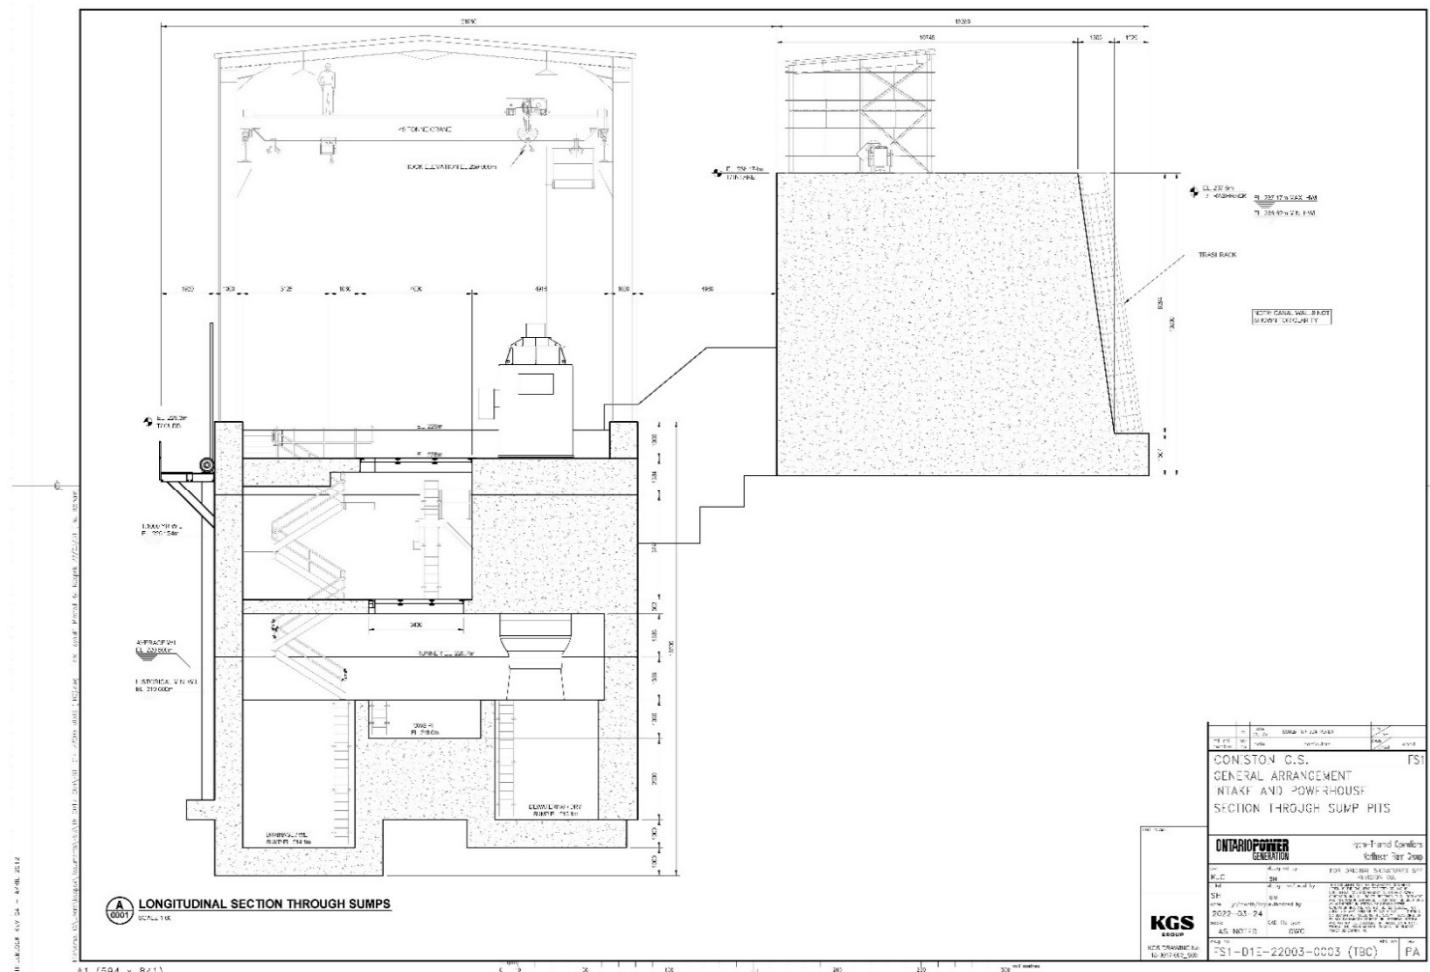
Proposed Powerhouse – Longitudinal Section for Intake and Powerhouse through the Sump Pits
